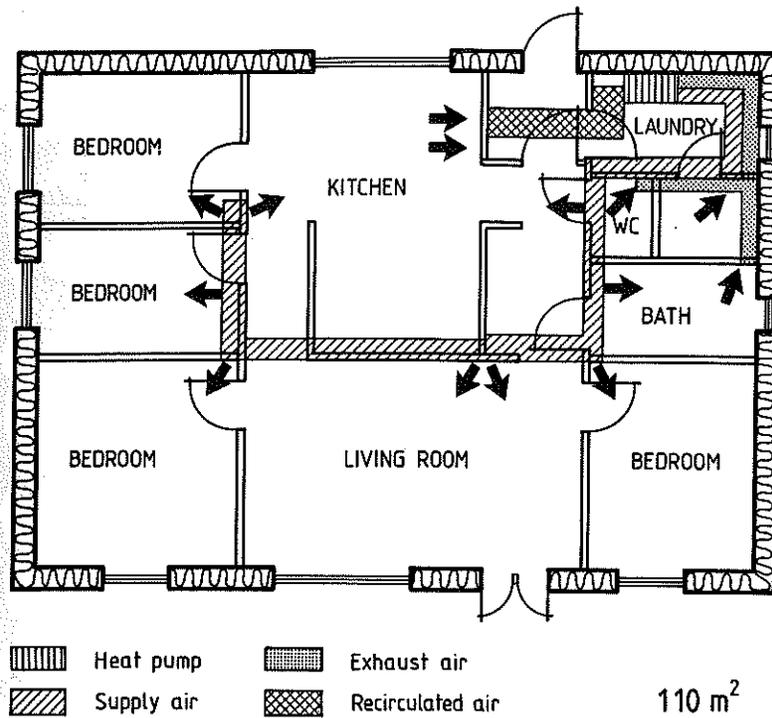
Plan of experiment house in Skovde. Experiment houses A and B in Stockholm are identical except for the level of thermal insulation
